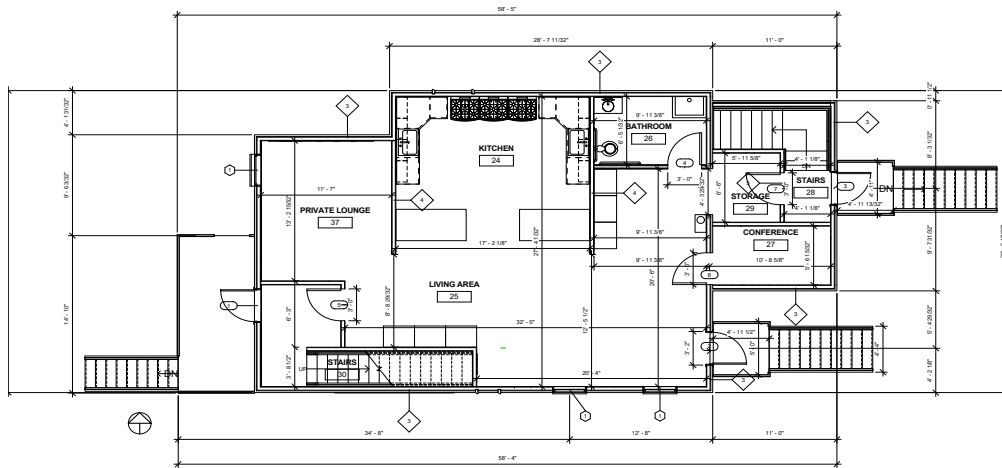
Baheera's first floor design submitted with her final construction documents (week 17). Notice the placement of the kitchen.
